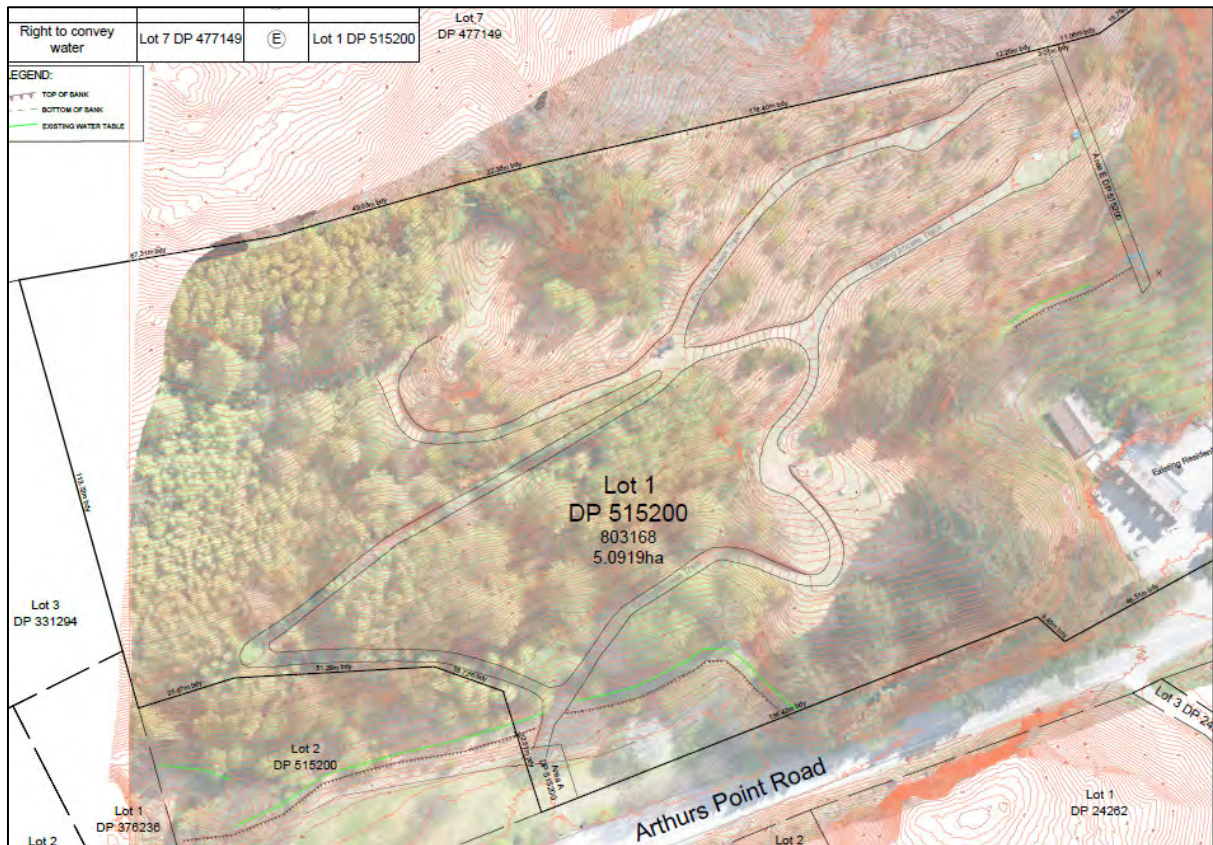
Topographic Plan of the subject site showing access tracks (refer Attachment [D] for full plan)
